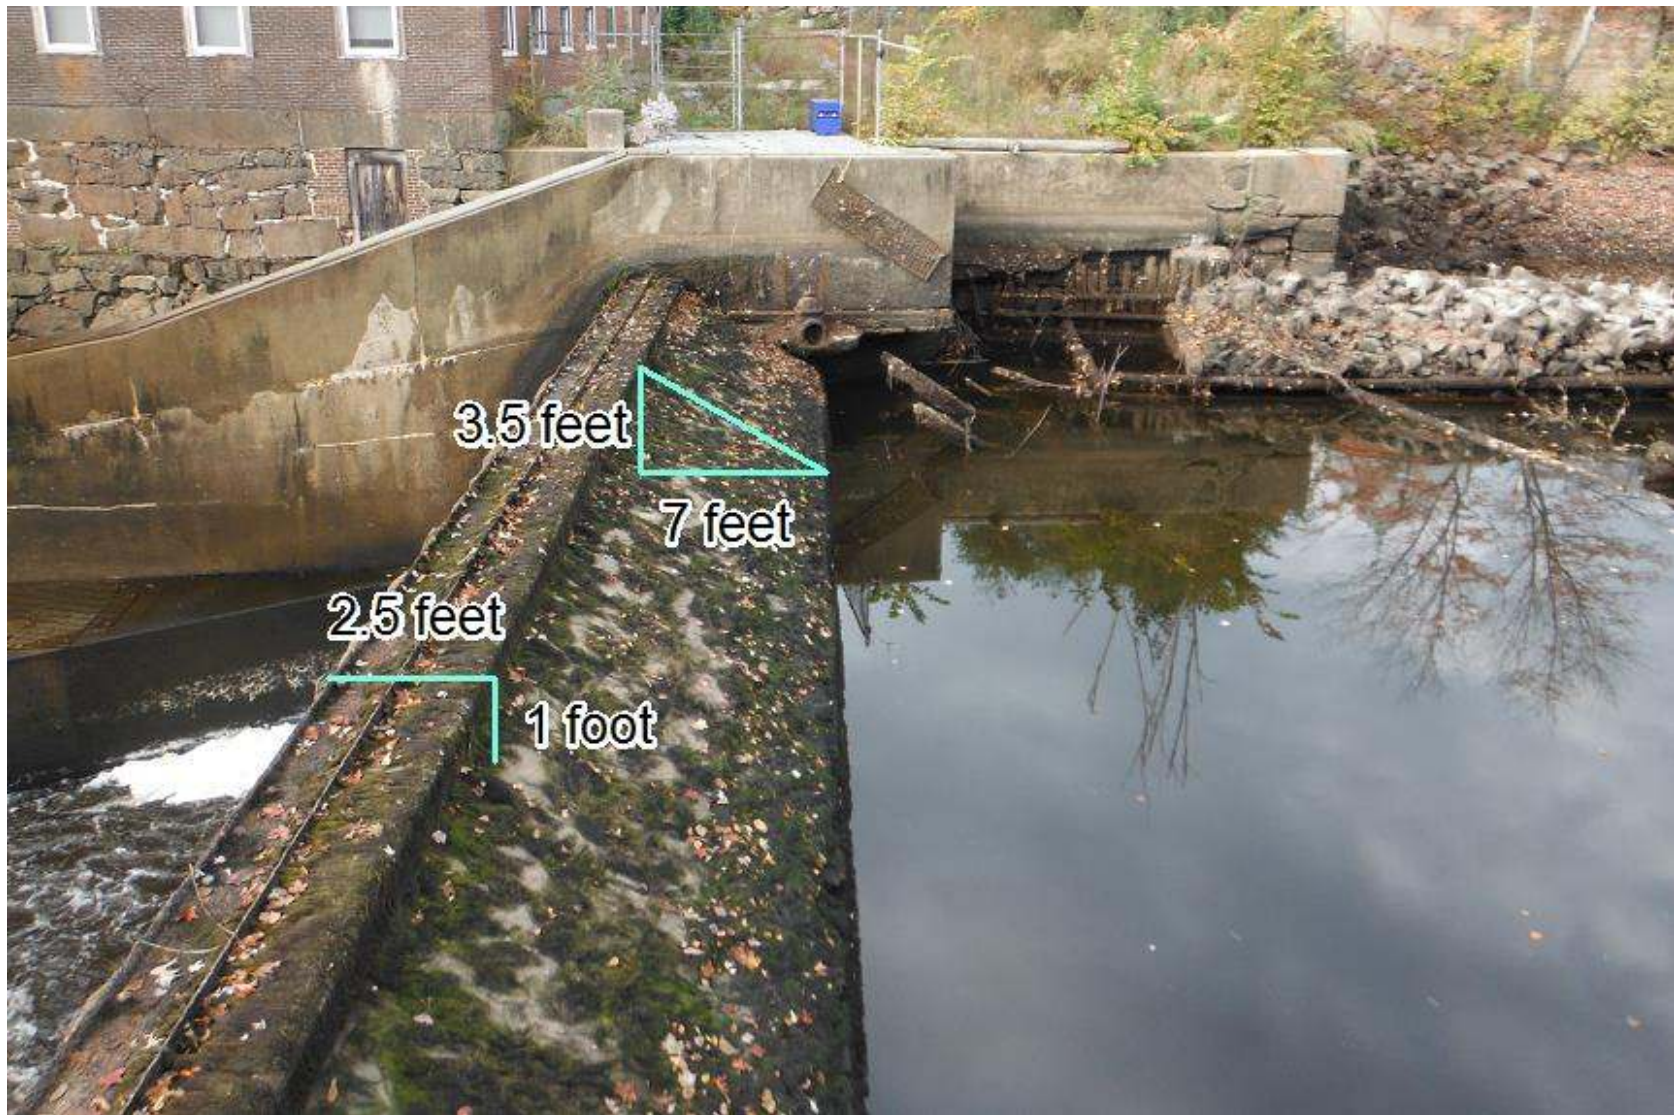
Photo of the dam's right abutment and spillway sections, including geometry of the sloped upstream face of the dam. Photo taken during the October 2013 drawdown. Note the metal lip running along the center of the spillway crest.
